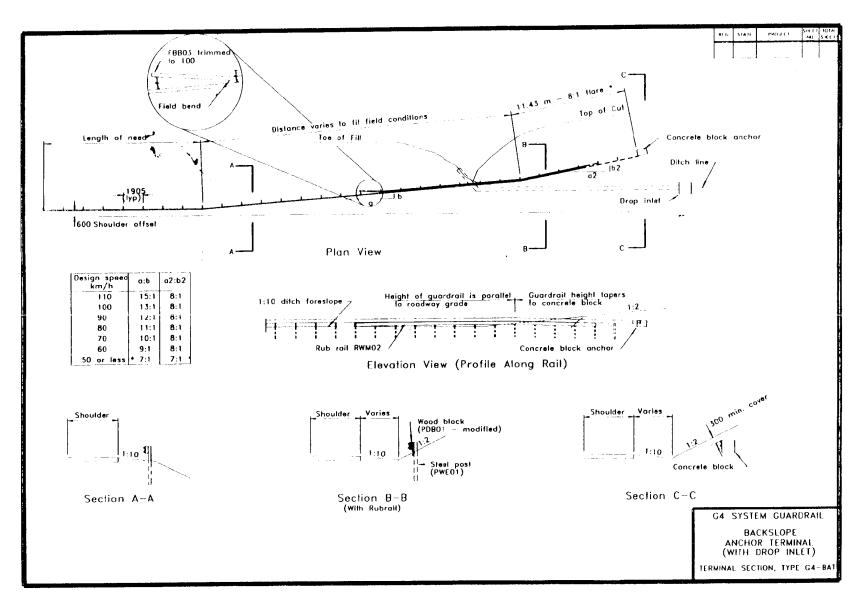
Details of the W-beam guardrail buried-in-backslope (with drop inlet) installation.
